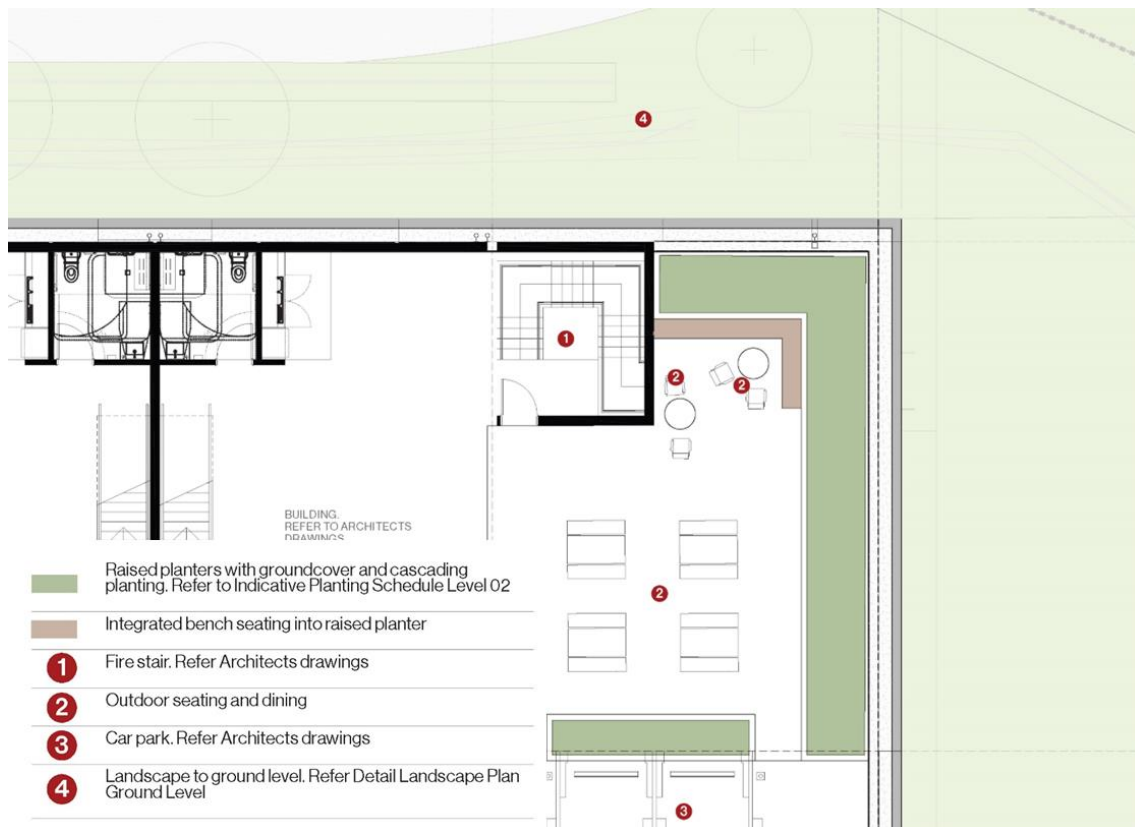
Breakout space provided at the north-eastern corner of Level 2 (Source: Place Design Group)
